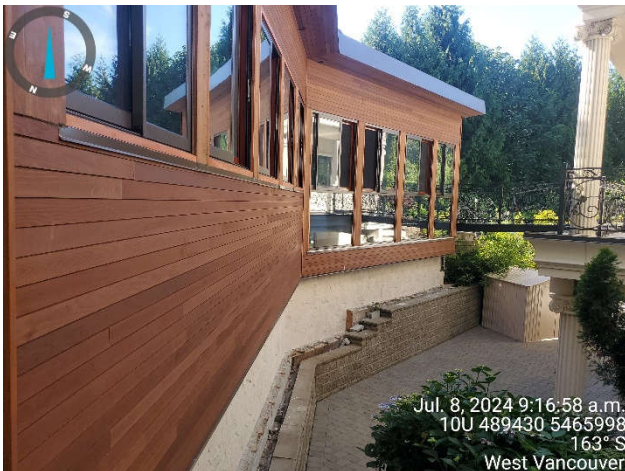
View of the east side of the unpermitted building adjacent to the paved patio.
